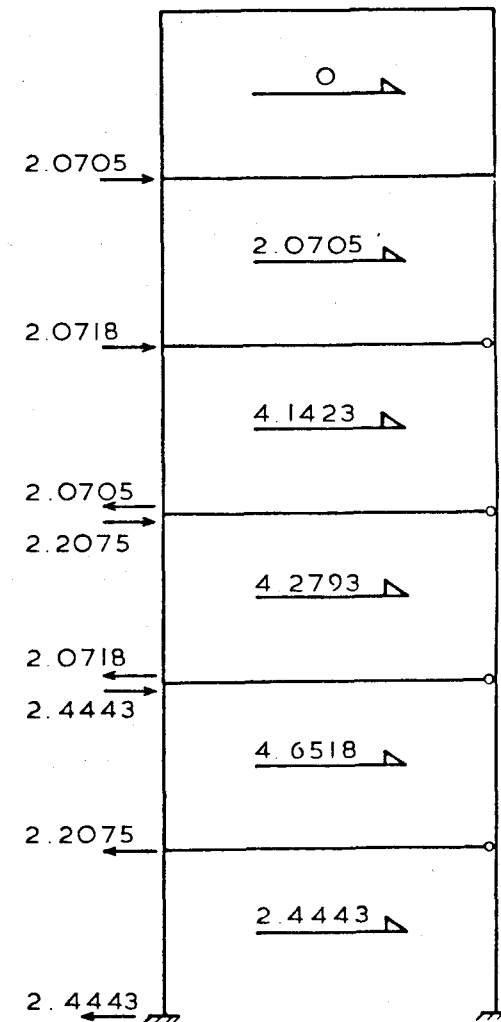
SIX STOREY SINGLE BAY FRAME
